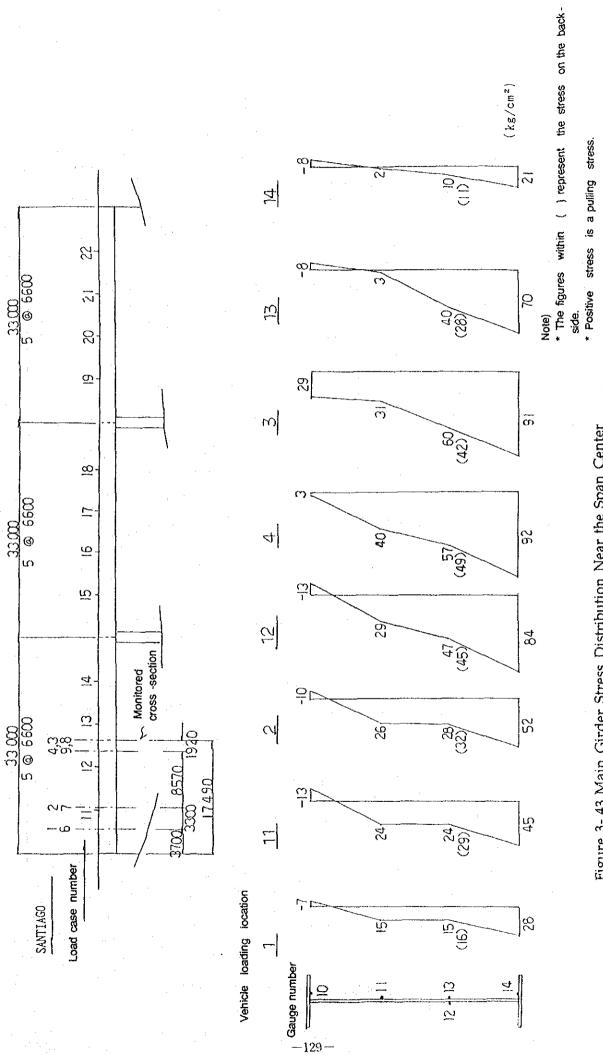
43 Main Girder Stress Distribution Near the Span Center
